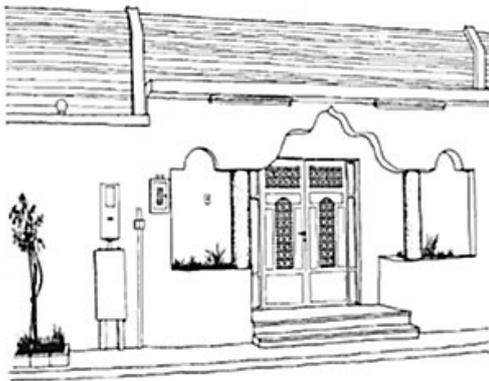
A transitional house that has extended its fence with wooden shingles.
